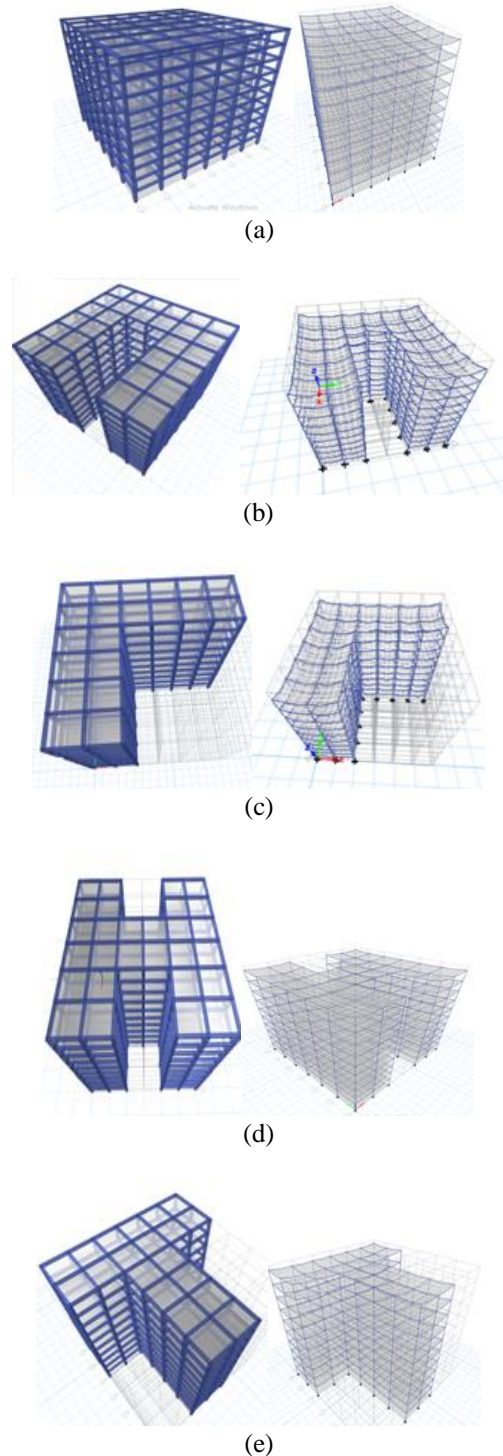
3-D view and deformed shape of structure (a) Rectangular (b) C-shape (c) L-shape (d) H-shape (e) T-Shape
